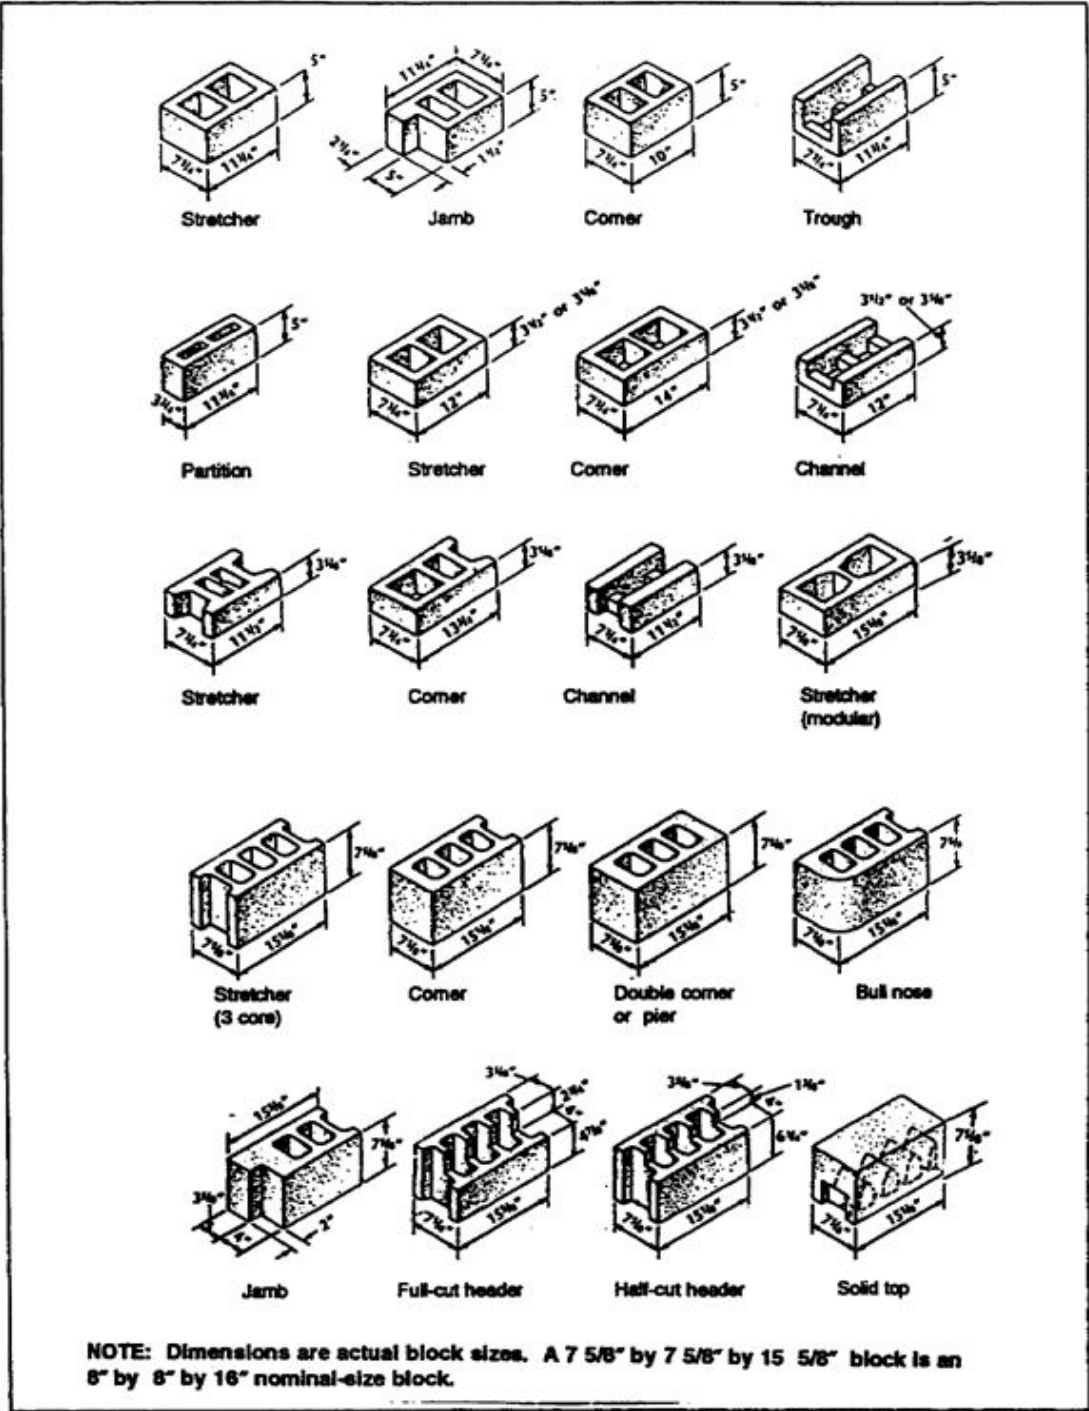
Typical shape of concrete blocks, taken from (<http://waybuilder.net>)
